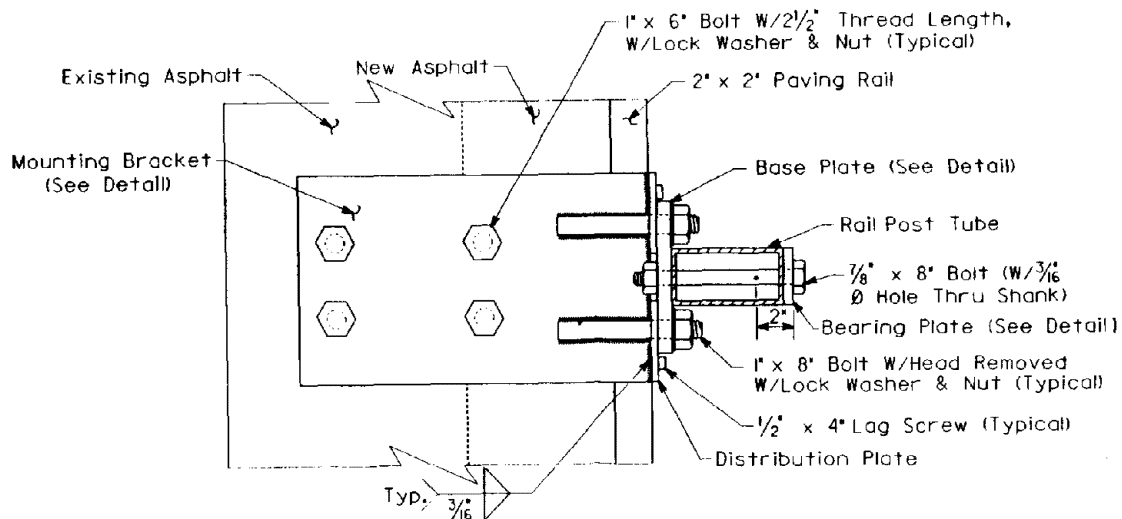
Special design required for SL1 retrofit rail base plate connection on existing timber bridge increased cost significantly.
